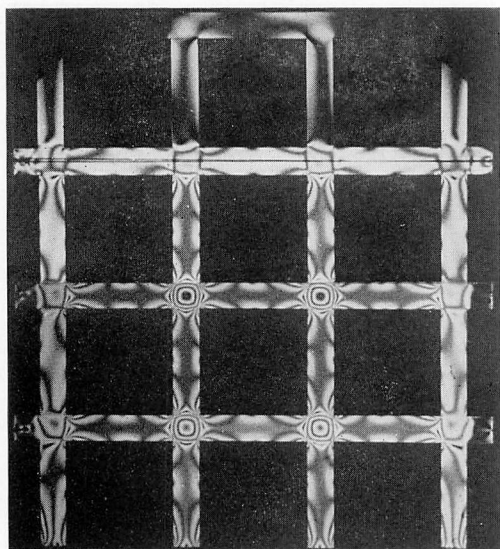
b Isochromatics of Frame without Wall panel Subjected to Lateral Forces on fourth Floor Beams
